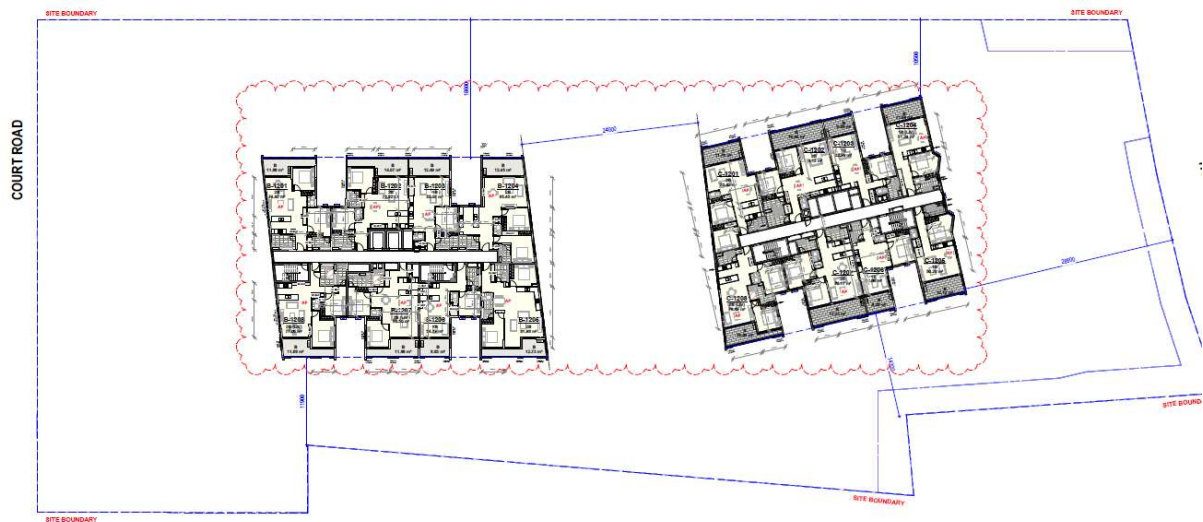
Proposed Level 12 plan proposing additional storey to Buildings B and C.
